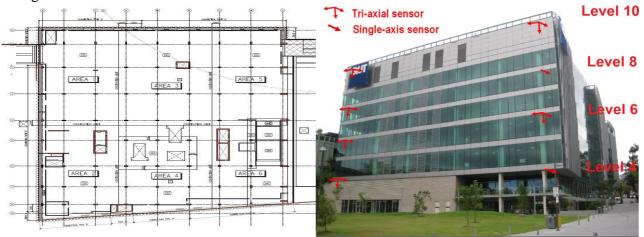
View of P block sensor arrangement and level 1 floor layout.
